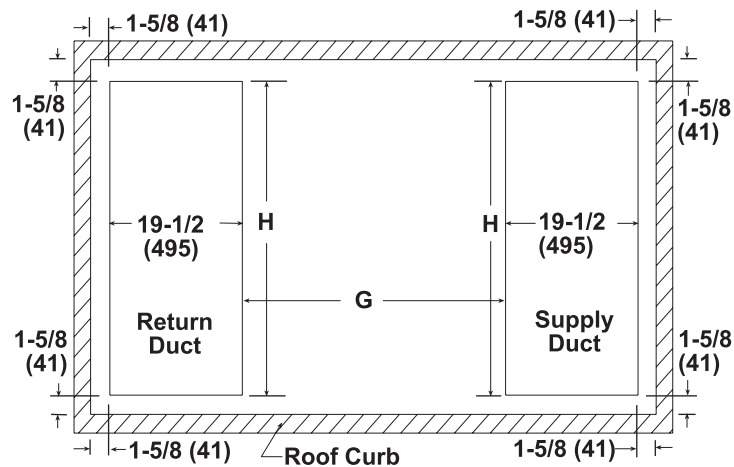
Bottom Duct Opening Dimensions (Refer to [Table 6](#))
